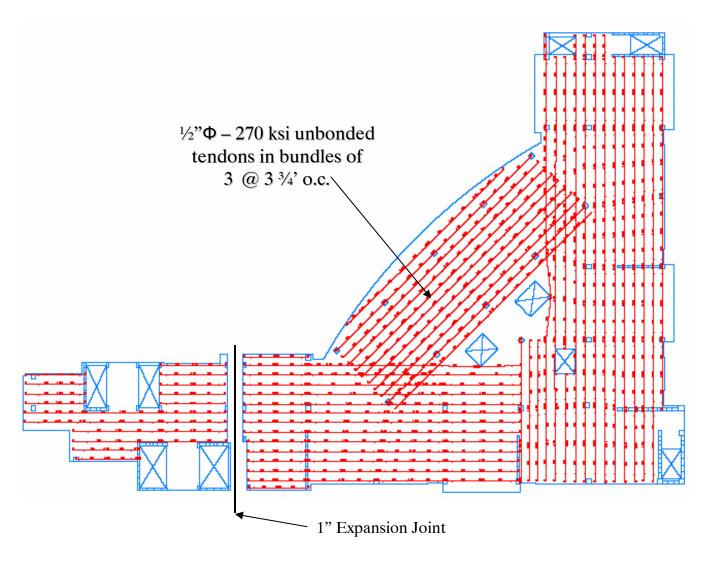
Typical Floor Uniformly Spaced Tendon Layout
